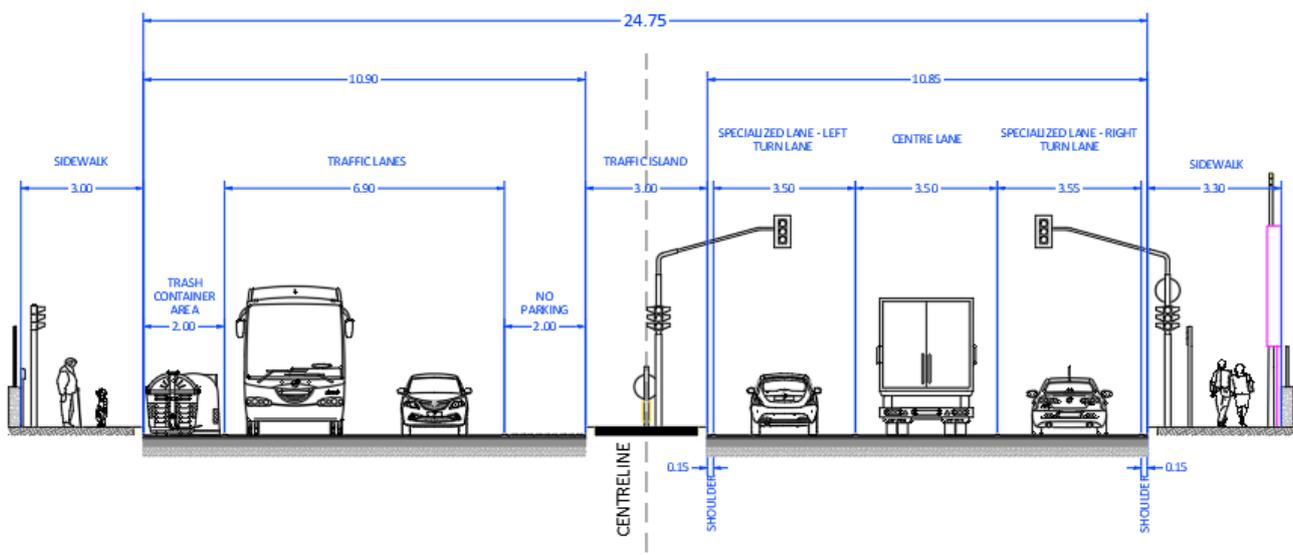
Cross section, intersection I - Viale Papa Giovanni XXIII.
